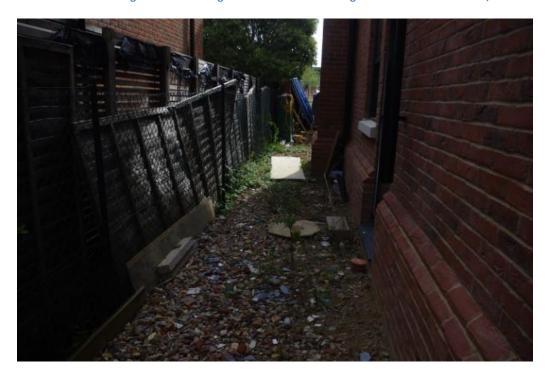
Looking along the western site boundary towards Beech Hill. A hedge where space allows and a green wall will be planted where space is restricted, in order to obtain BNG.
